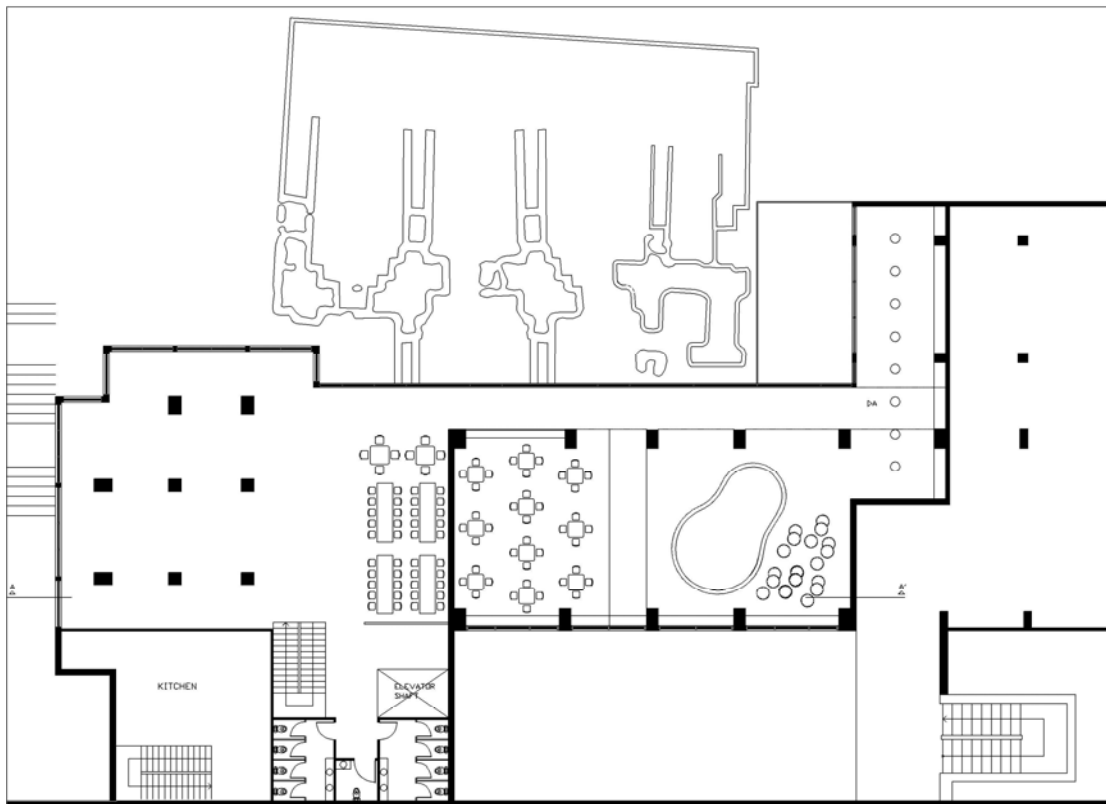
First floor plan for the new museum (Drawing by M. Bige Varlier)
